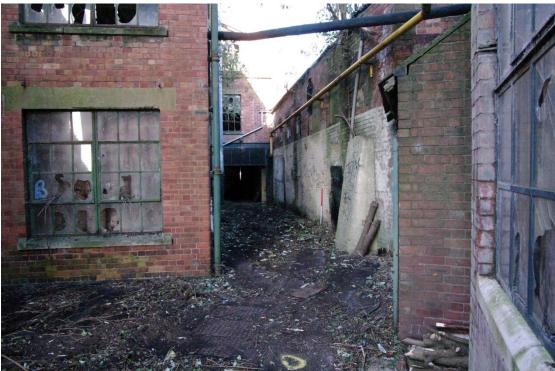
Southern end of passageway between Buildings R2 and U/T Looking north-west towards covered portion of passageway (see Fig 63). Building R on right
